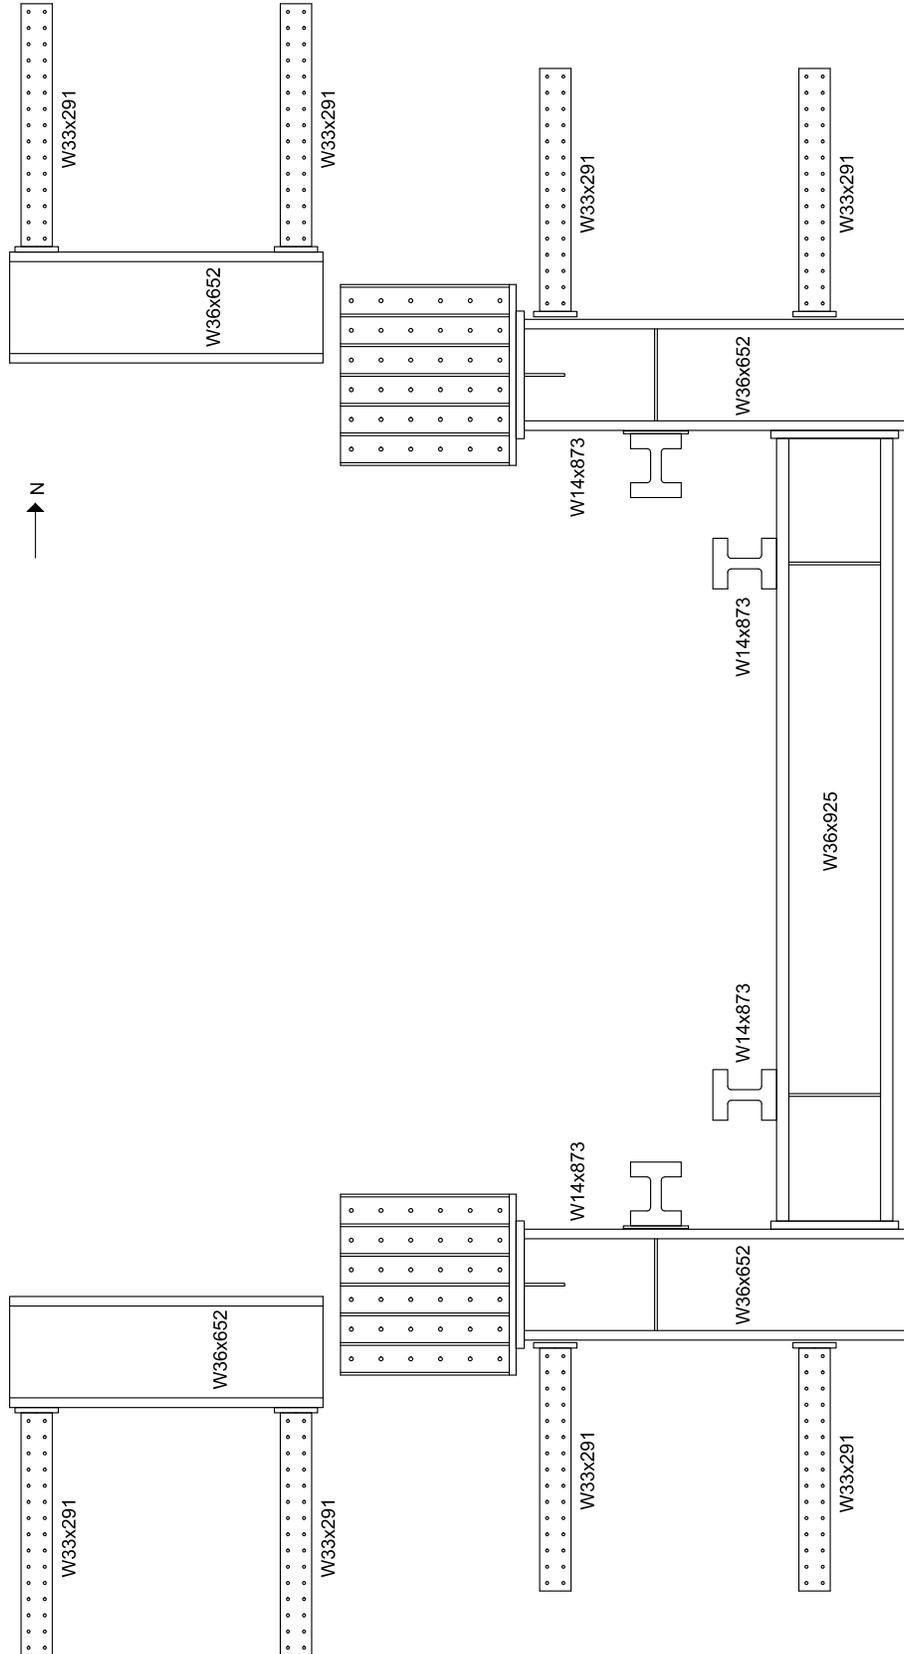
below includes most elements of the test setup: the test frame, a beam specimen, a column specimen, the hydraulic actuators, and the lateral bracing. The instrumentation is not included in this figure. Drawings with the locations of the instrumentation can be found in the instrumentation plan in Appendix J. The test setup drawing for each specimen are in Appendix H. These tests were set up so that the specimens were in the horizontal plane. The centerline of the specimens was 22 inches from the ground. The lateral bracing was placed to prevent lateral torsional buckling, and to minimize the effects of self-weight.
